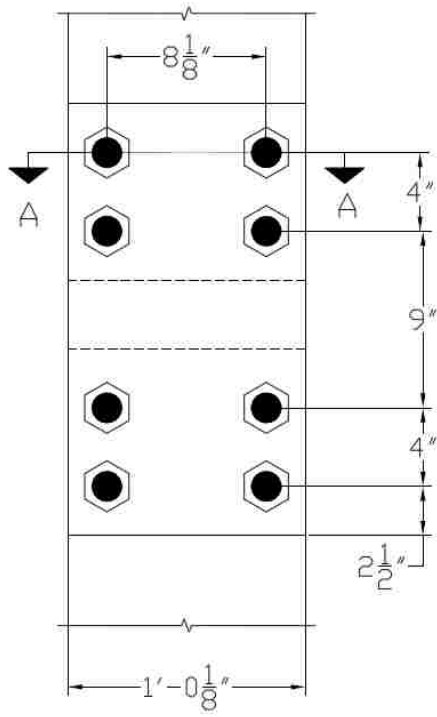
Bracing Frame Column Repair (Detail 1 of Figure 4.33) East Elevation
